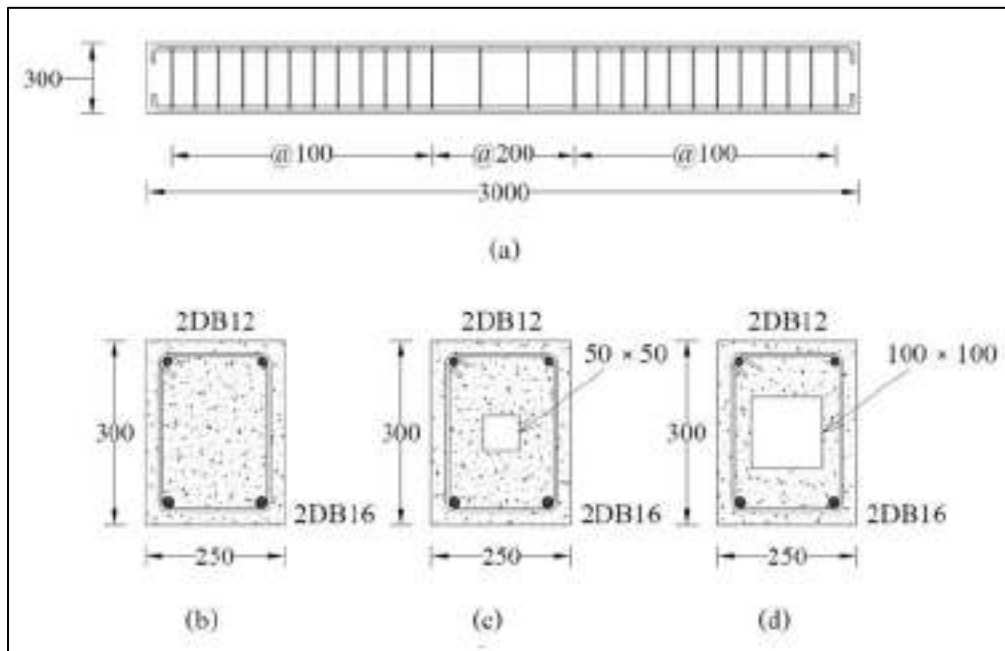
Typical beams in each group (a) longitudinal section, (b) solid section, (c) hollow section HS50, (d) hollow section HS100 [49].
